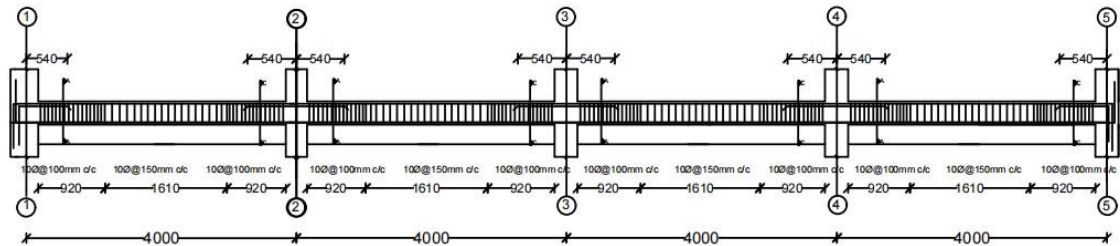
Reinforcement detailing of Beam section of Floor 1 to floor 10
